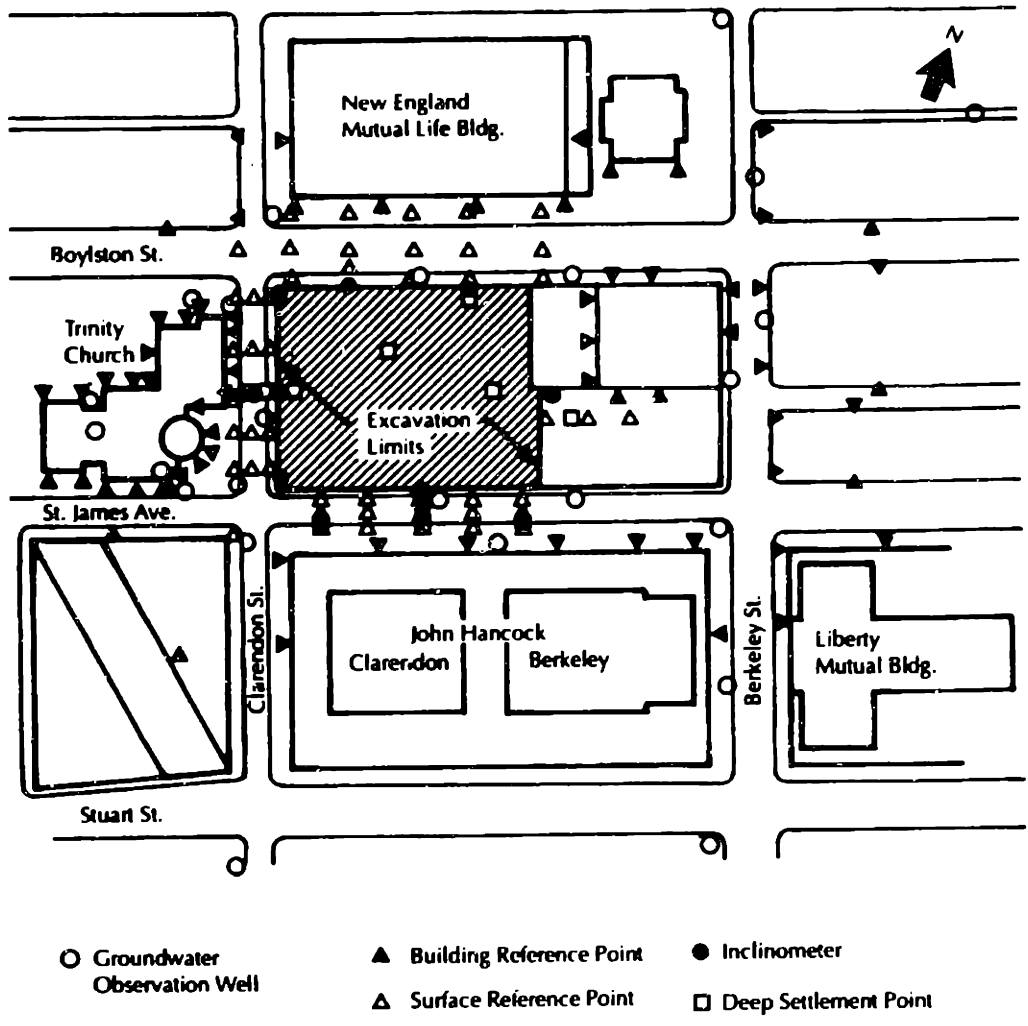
Instrumentation location plan for 500 Boylston Street (Erikson, et al., 1992).
